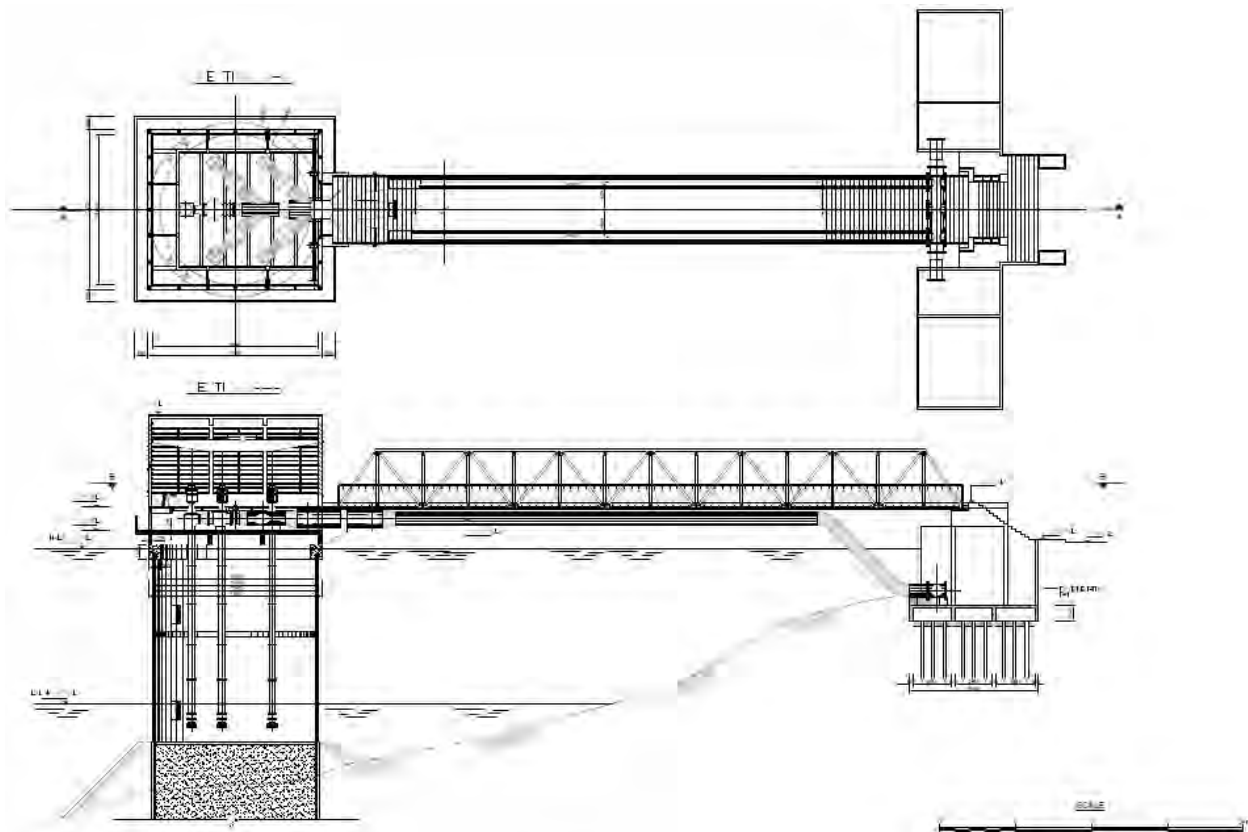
General Layout of Phum Prek Raw Water Intake Facilities
